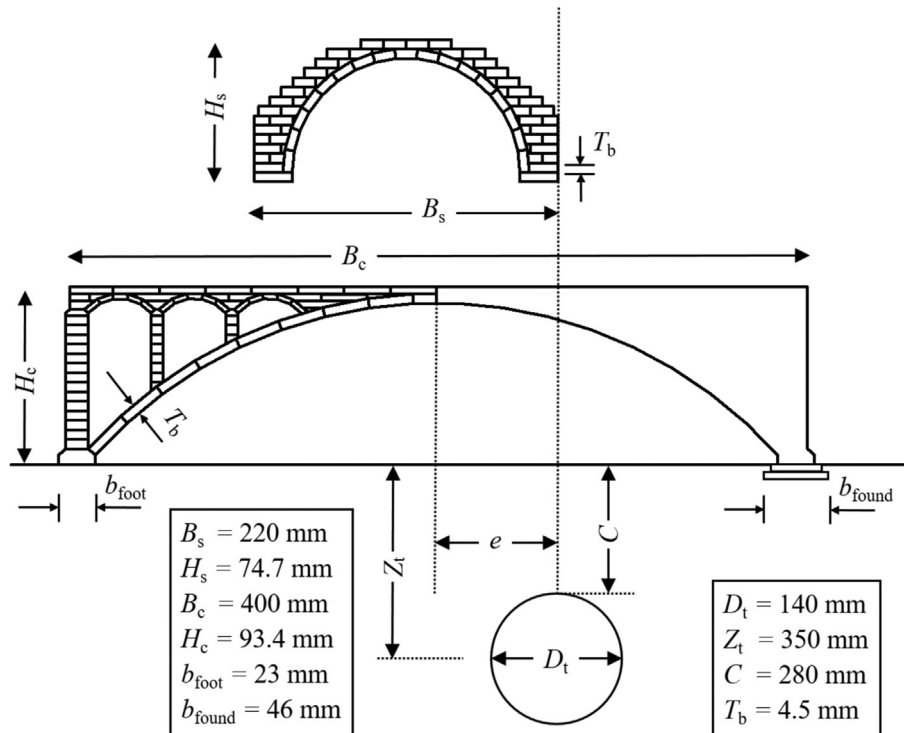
Test layout in model scale dimensions. (Note: B_s – building width of semi-circular arch bridge; H_s – height of semi-circular arch bridge; B_c – building width of circular arch bridge; H_c – height of circular arch bridge; b_{foot} – width of separate footing; b_{found} – width of spread foundation; D_t – diameter of tunnel; Z_t – depth of the tunnel axis; C – cover depth of tunnel crown; T_b – thickness of building element).
